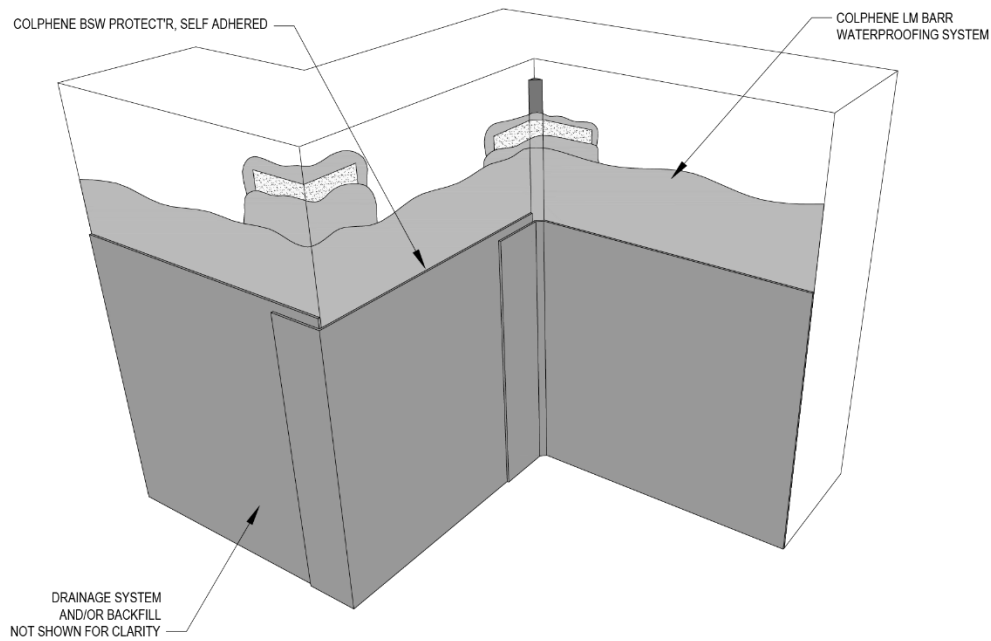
COLPHENE® BSW PROTECT'R Protection Course At Inside/Outside Corners
